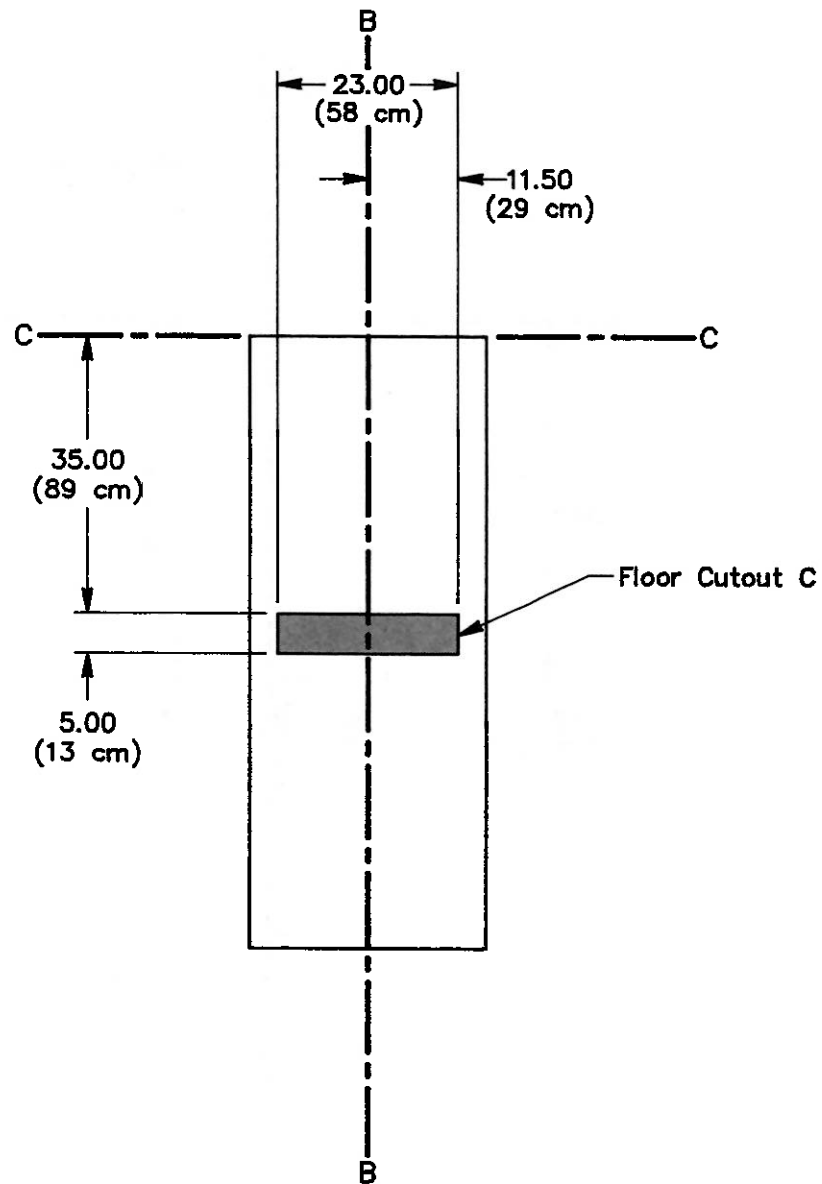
Location and Dimensions of MFC Floor Cutout C
